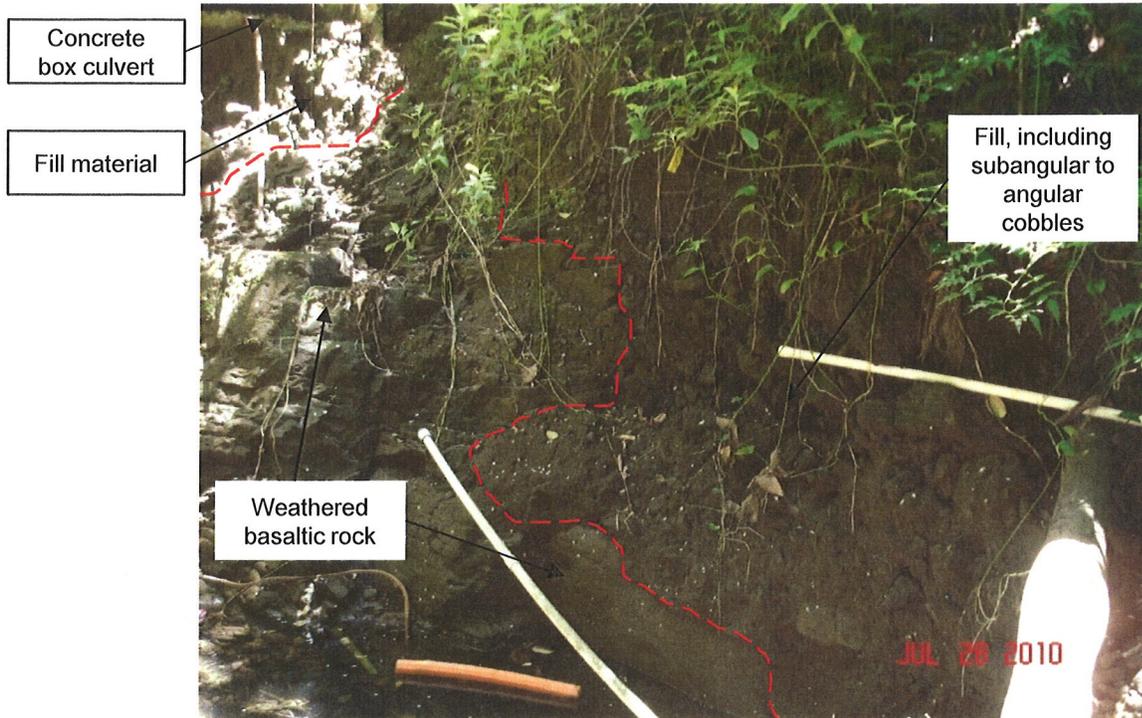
West sidewall of gulch near culvert consists of fill material, facing south.
